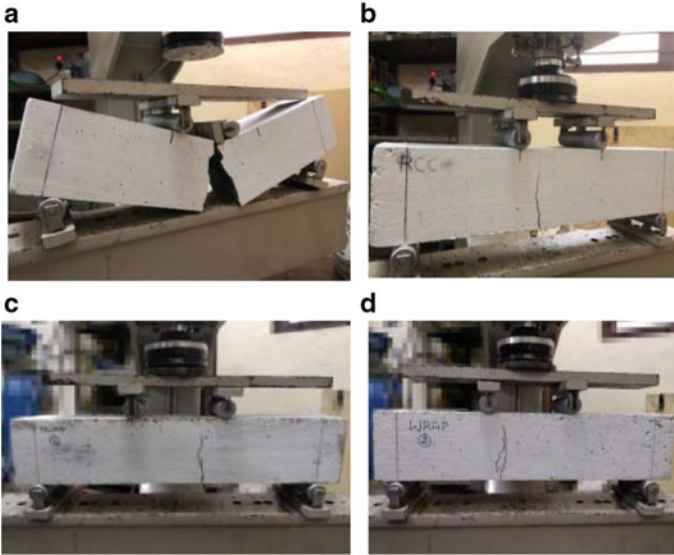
a Failure pattern of plain concrete beam; b GI reinforcement; c PP geo-fabric wrapping; d PP geo-fabric facing
